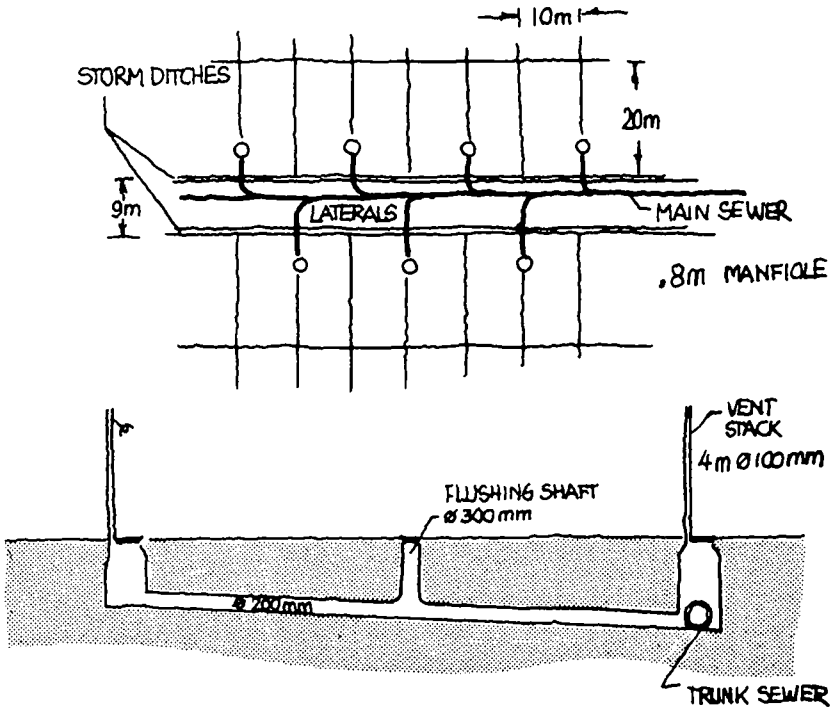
Plot drainage, laterals, mains, and trunk sewers, FS system
